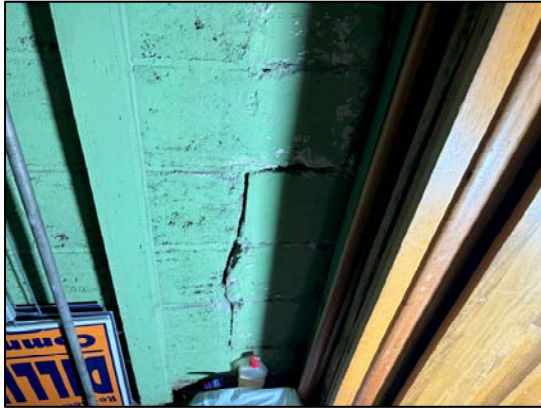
General view of cracked mortar along the basement stairwell
